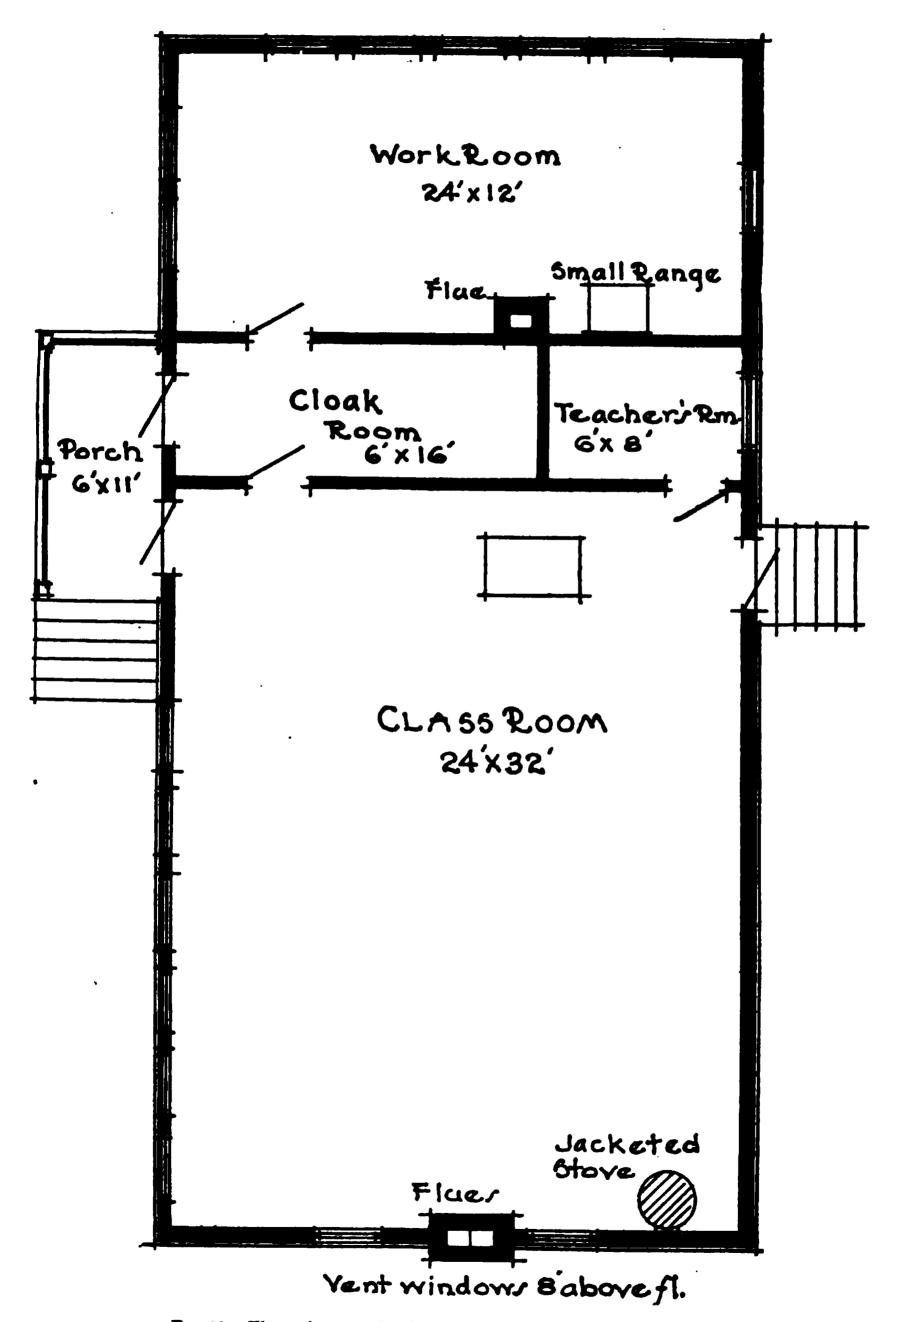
Floor plan, one-teacher rural school, York County, S. C.
